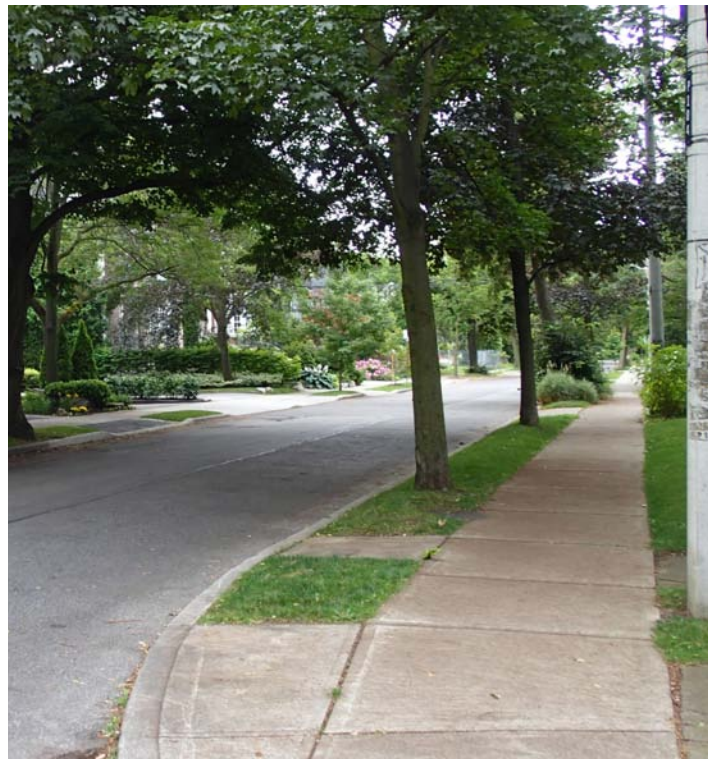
Lyndhurst Avenue - Sidewalk with Planted Boulevard
